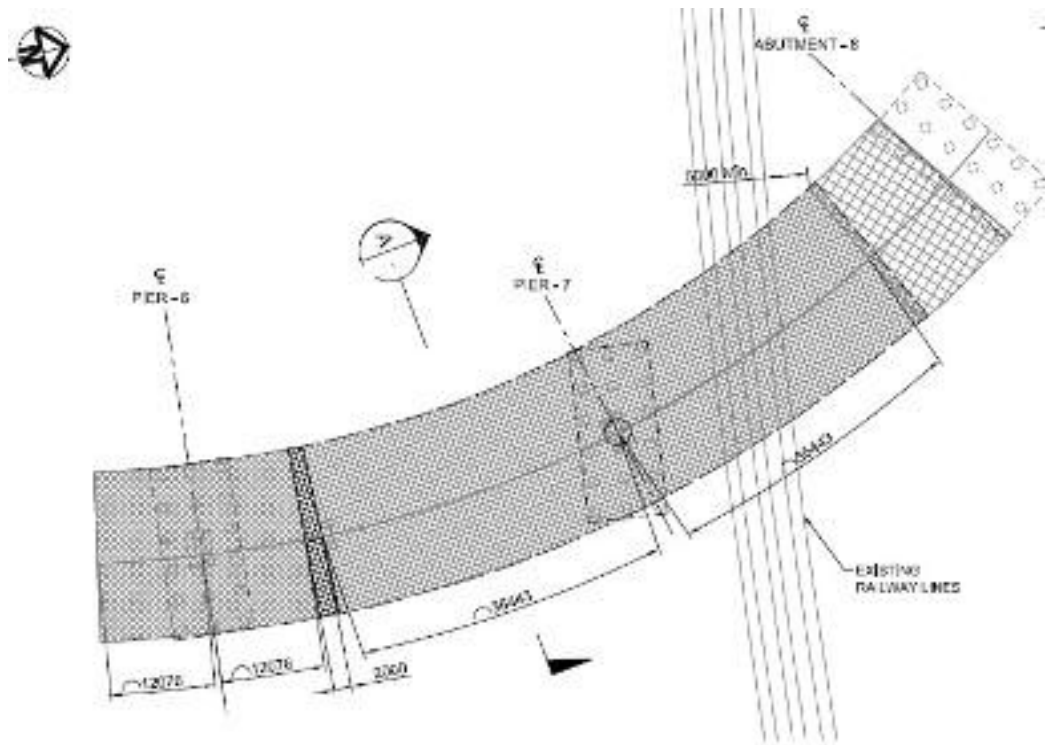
Sketch showing area of cantilever construction after the completion
